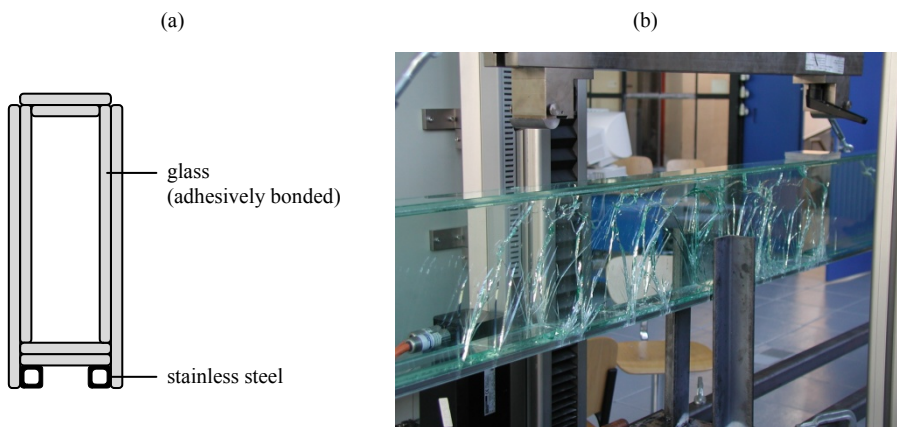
Reinforced glass box-section beam [Louter, 2004];
